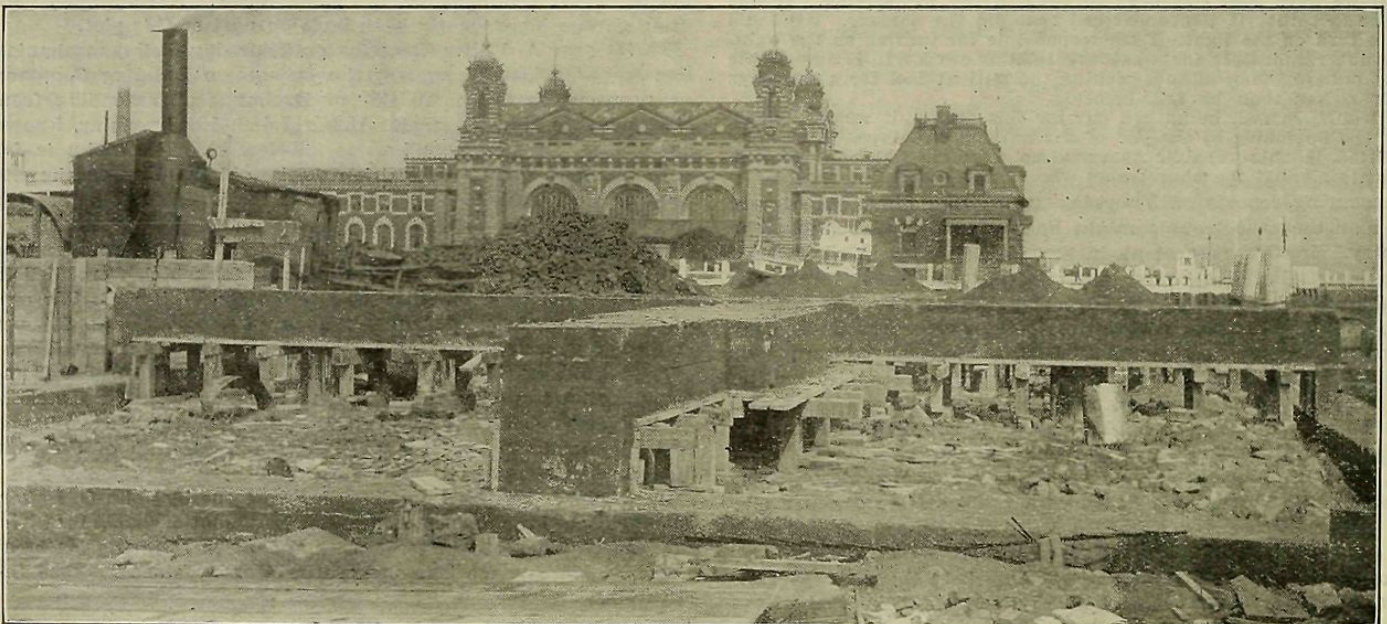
A novel method of foundation construction as carried out at Ellis Island. The floor and foundation girders of the superstructures are built directly upon the tops of the concrete piles.
